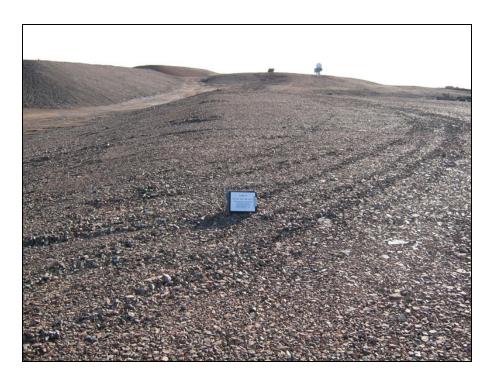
B. Toe of slope near northeast corner. Orange staingin and seepage discharging onto rocks at toe of landfill. Down-slope of photo SNH-12____ ↑
